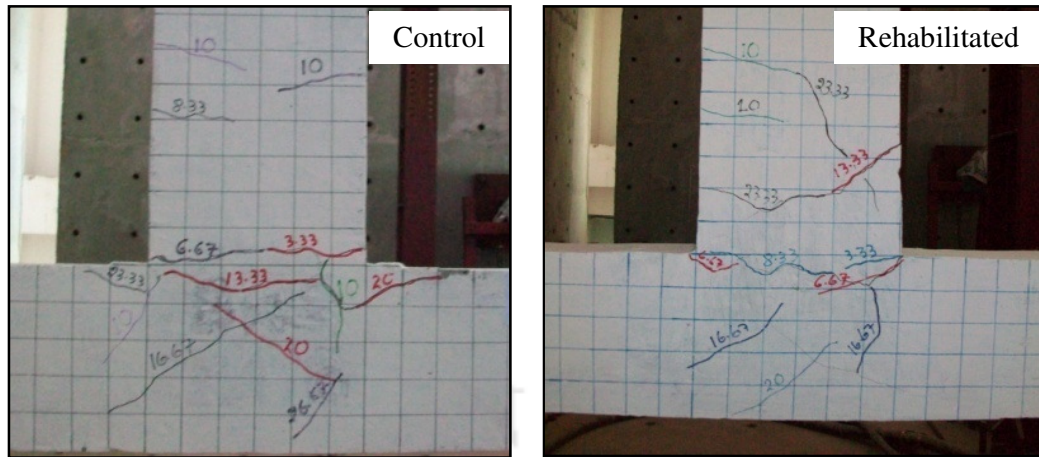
Appearance of cracks for BWSM specimens under loading type-2 corresponding to peak load
